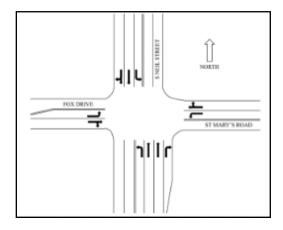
Geometry of the intersection of Neil Street and St. Mary's Road.
